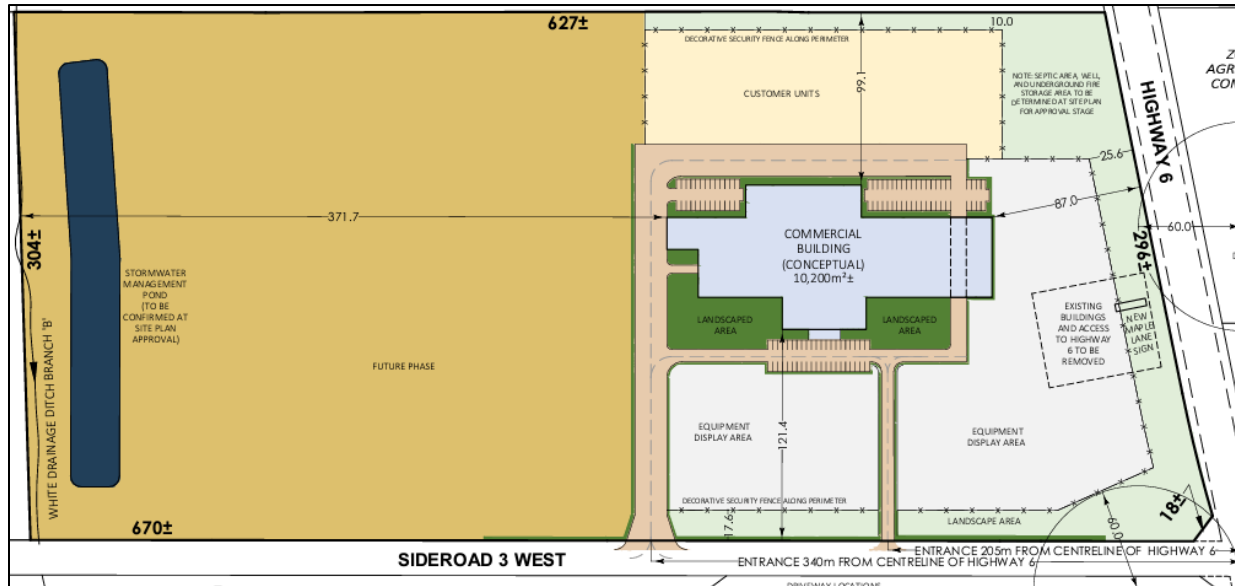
Site Plan submitted by Van Harten Surveying Inc., December 2023
